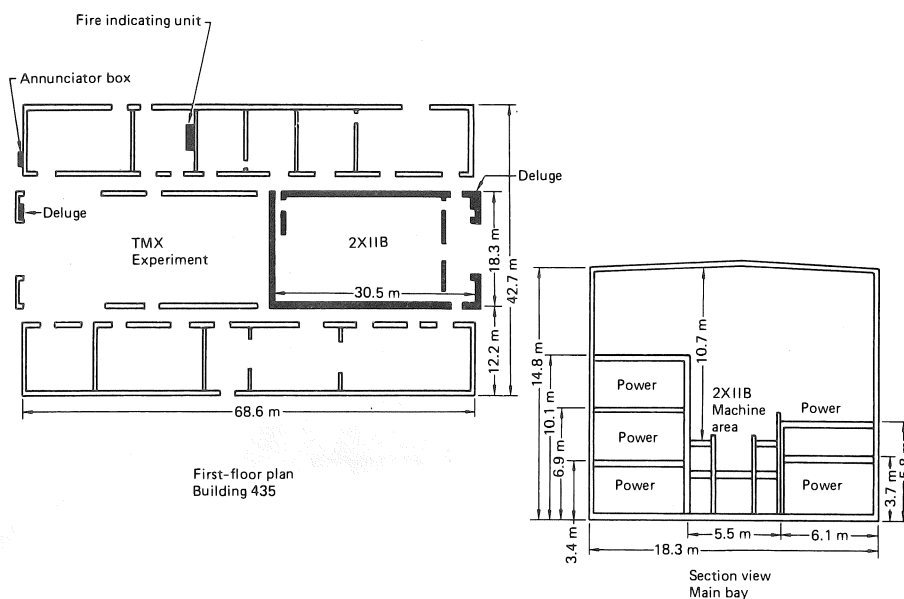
Plan and transverse section of building 435 devoted to the 2XIIB experiment.
